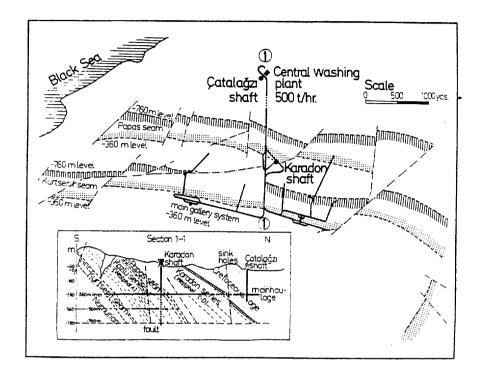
Plan and section of Karadon and Catalagzi section (Mattes, 1975)
